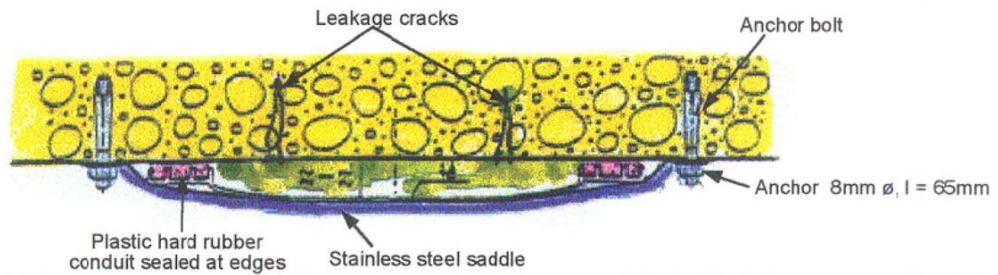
Stainless steel saddle anchored to concrete for conveying water through leakage cracks (Russell, 2001).
